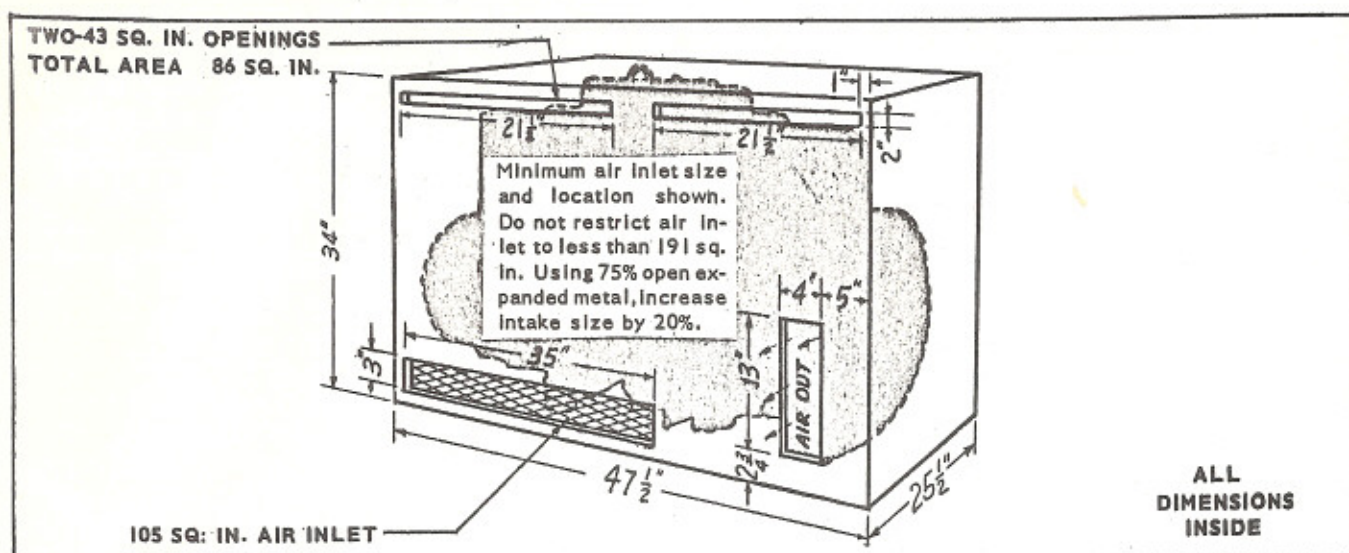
TYPICAL ENCLOSURE DIMENSIONS FOR JB VACU-FLO PLANT
